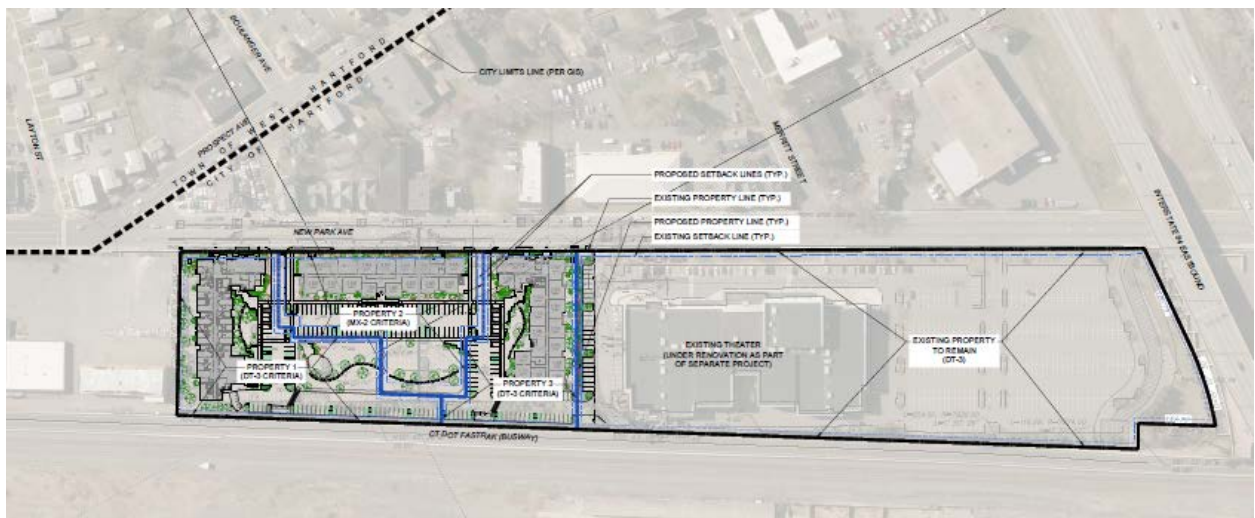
Variance Application Overall Plan, provided by the Applicant as part of the Application plan set, Attachment 3 of this report. Depicts full 330 New Park parcel and proposed lot division.
